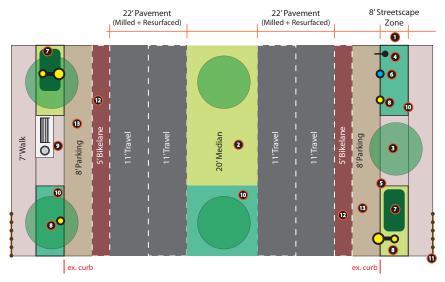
East Jefferson 1B/2 Type Plan-Section: Full Level of Development
